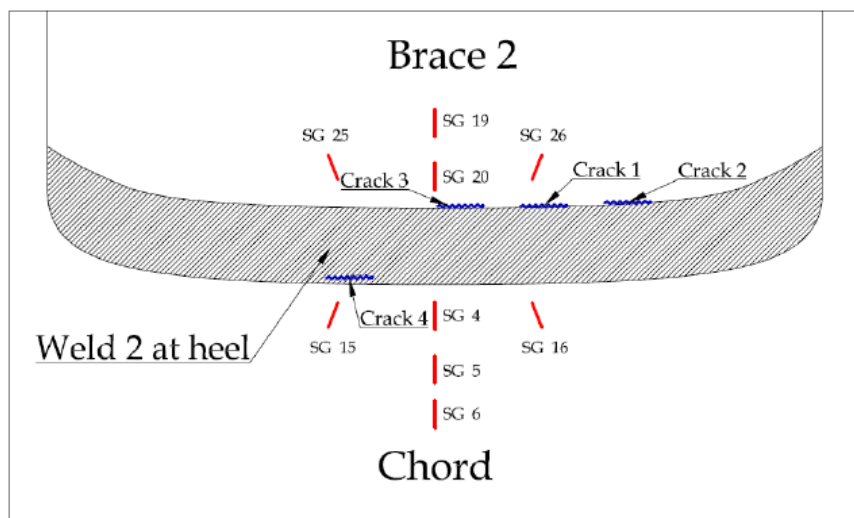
Schematic view of cracks at joint 2 of the Axial+IPB node. Red lines indicate strain gauges and blue lines indicate cracks.
